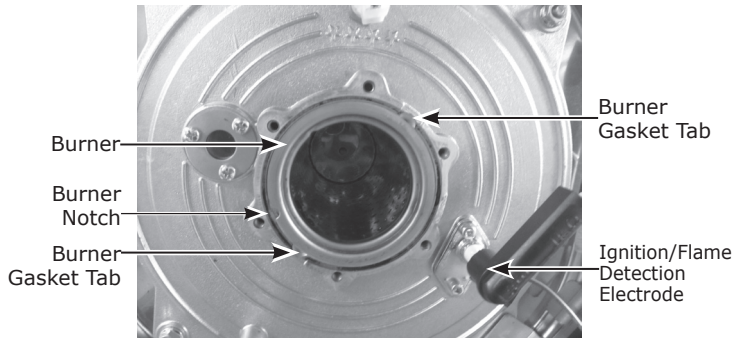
Combustion Chamber Cover with Air/Gas Mixer Assembly
